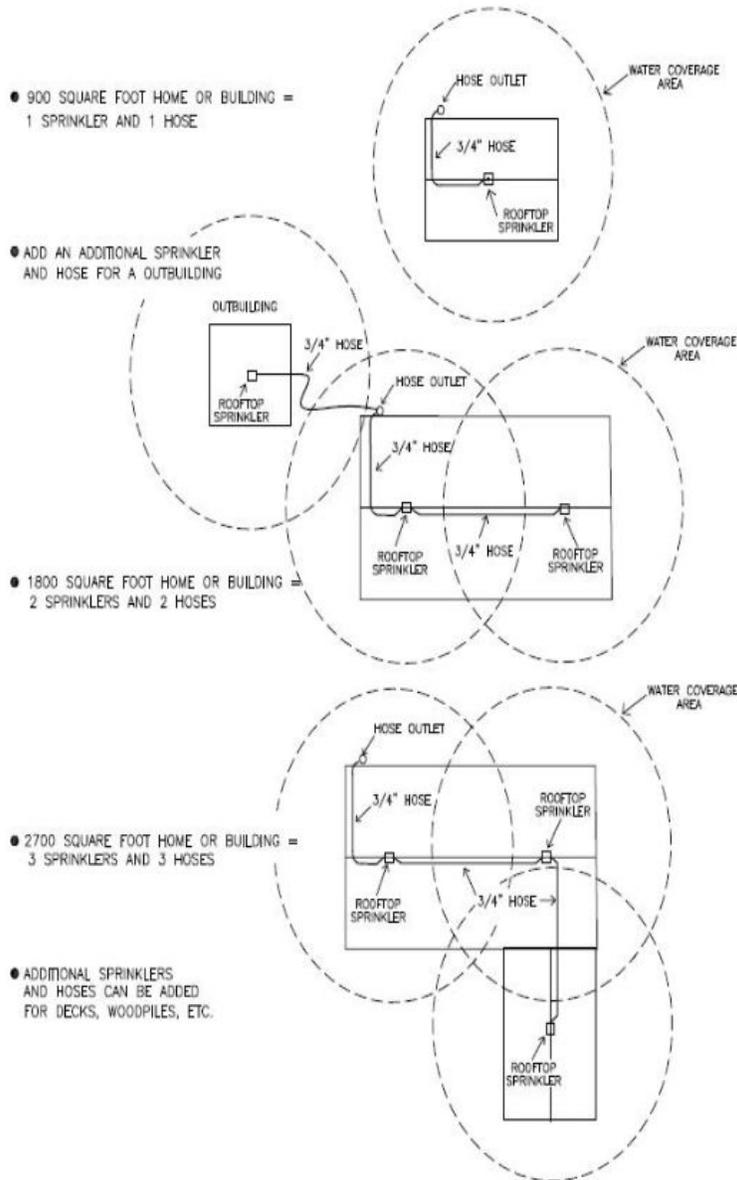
RoofSaver Sprinkler and Roof Installation Guide [m]
